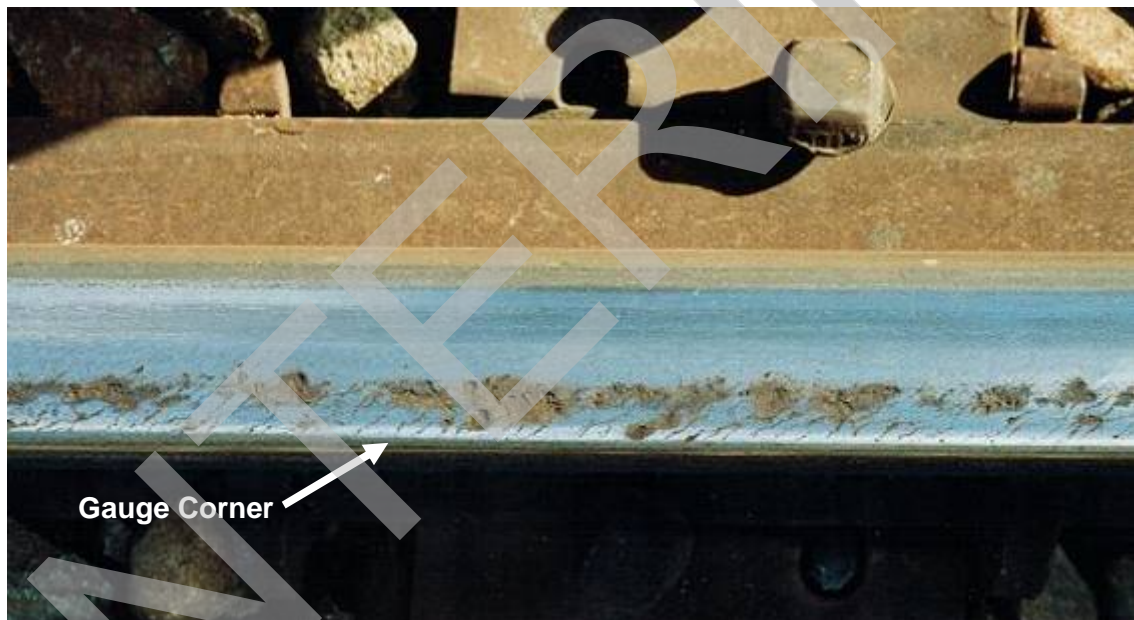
(c) Severe stage of development of gauge corner checking cracks and spalls
